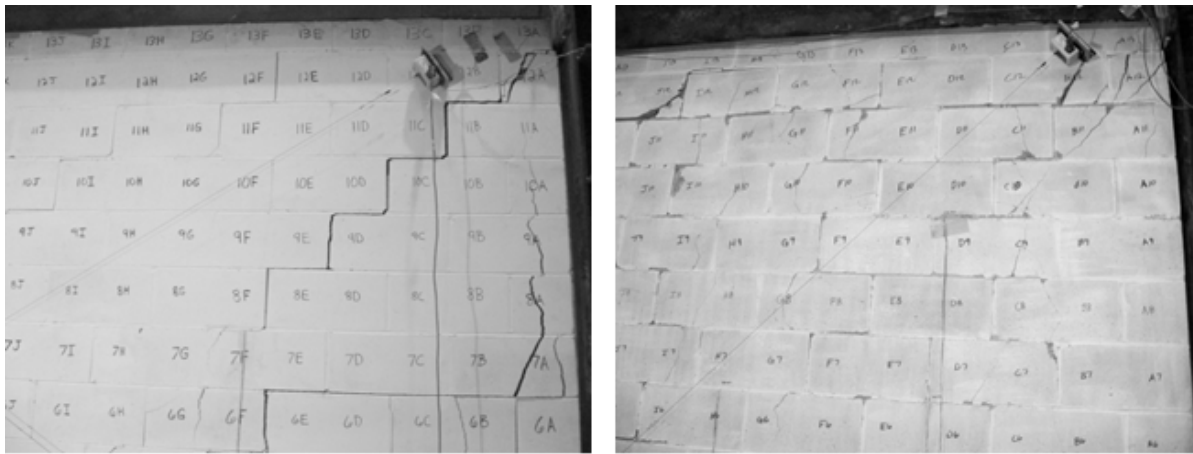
(a) Shear Wall 3 Restrained Cracks at Mid-Height Bond Beam (course 7) beyond Peak Load (left) and (b) Shear Wall 8 Beyond Peak Load (right)
